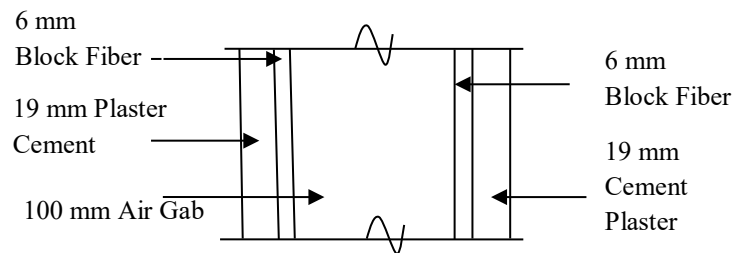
Cross-Sectional Detail of Block Fibre Wall
